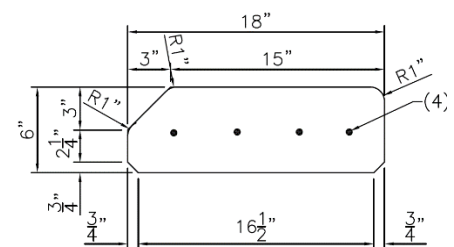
Cross-section of an 8-ft long pre-cast concrete curb
